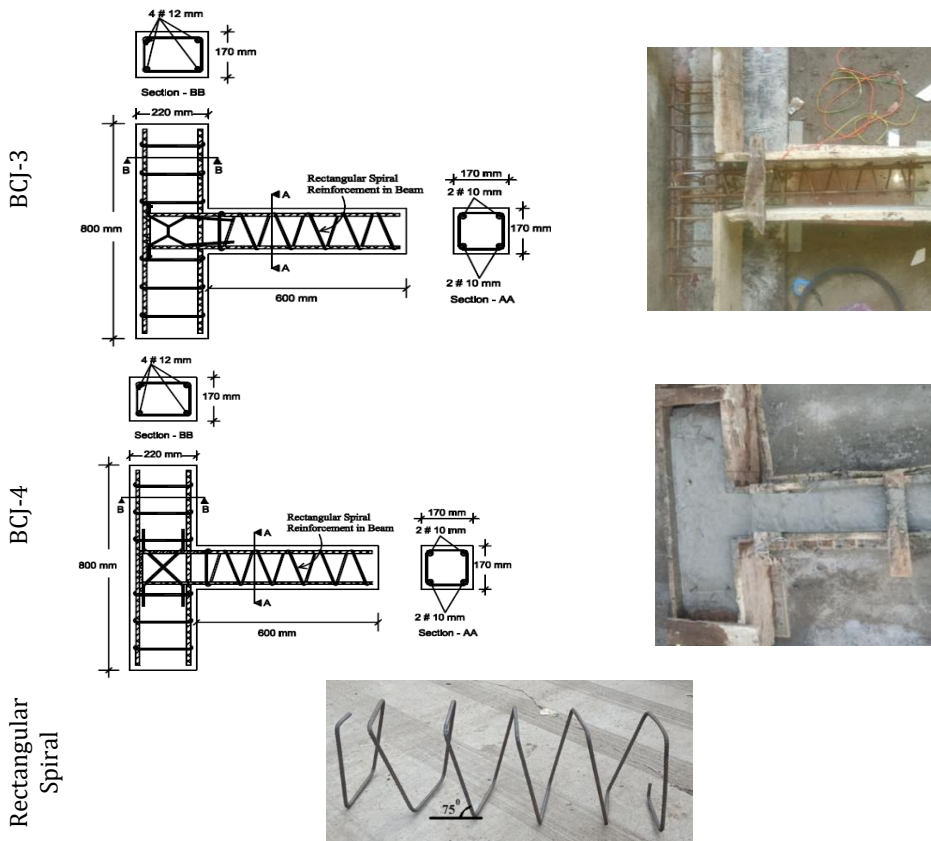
Beam-column joint reinforcement details - rectangular spiral
